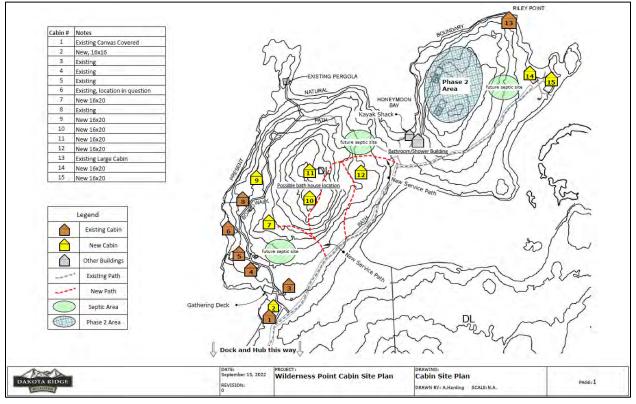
Wilderness Point Cabin Site Plan provided to DHC.
